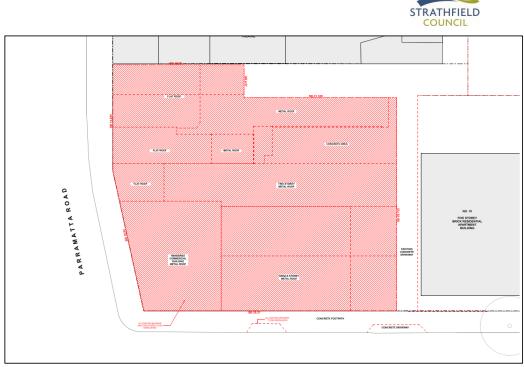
Proposed demolition plan showing existing structures on the site proposed to be demolished.
